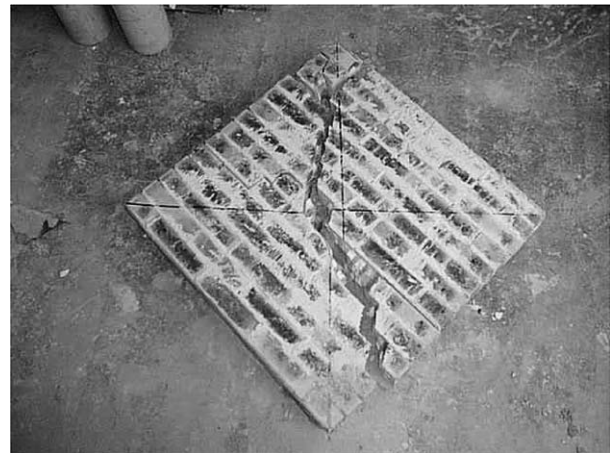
Failure pattern of the masonry panel in diagonal compression.
